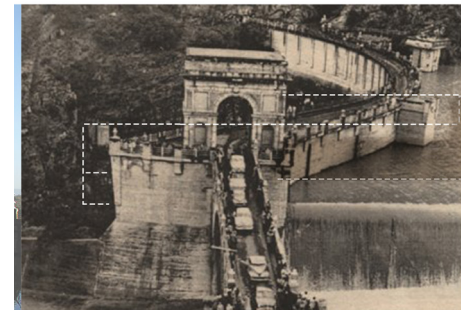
the Arch on the dam wall (Ewisa. 2016).
